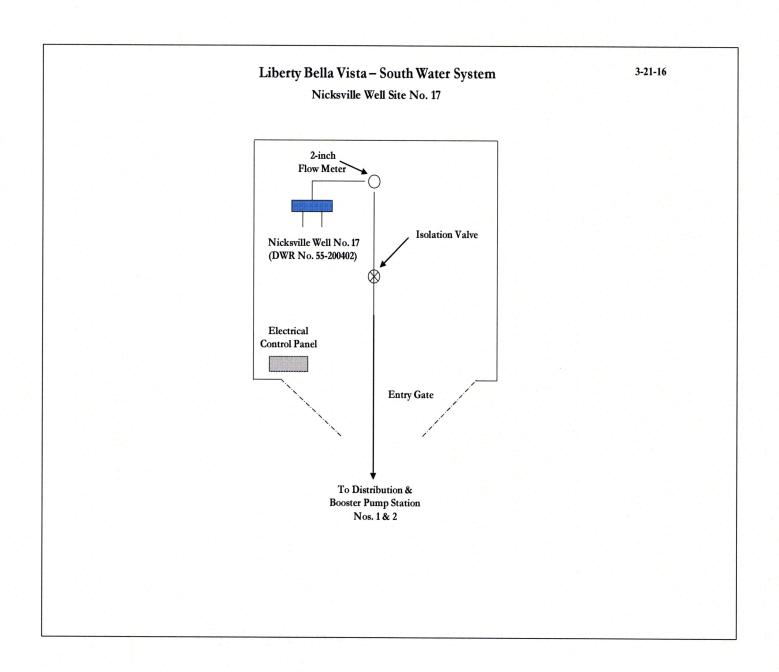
SOUTH WATER SYSTEM NICKSVILLE WELL SITE NO. 17
